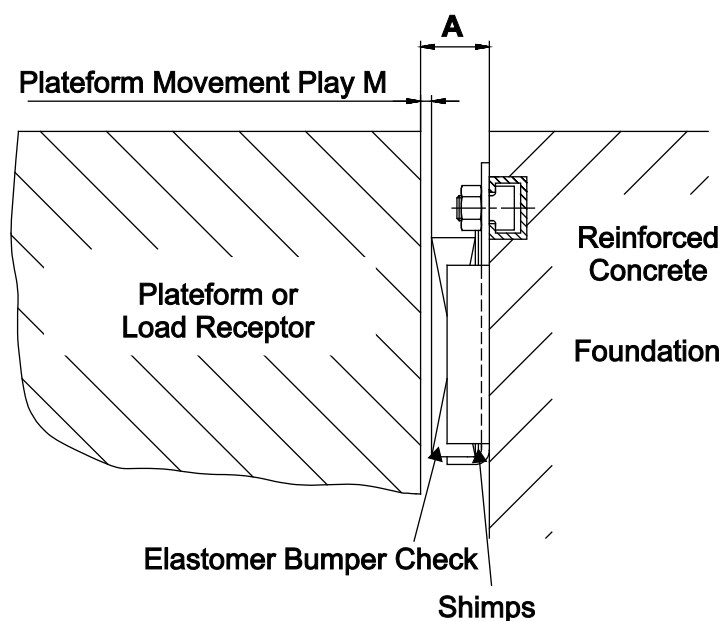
An elastic bumper DES used in a concrete structure (e.g. vehicle scales)
